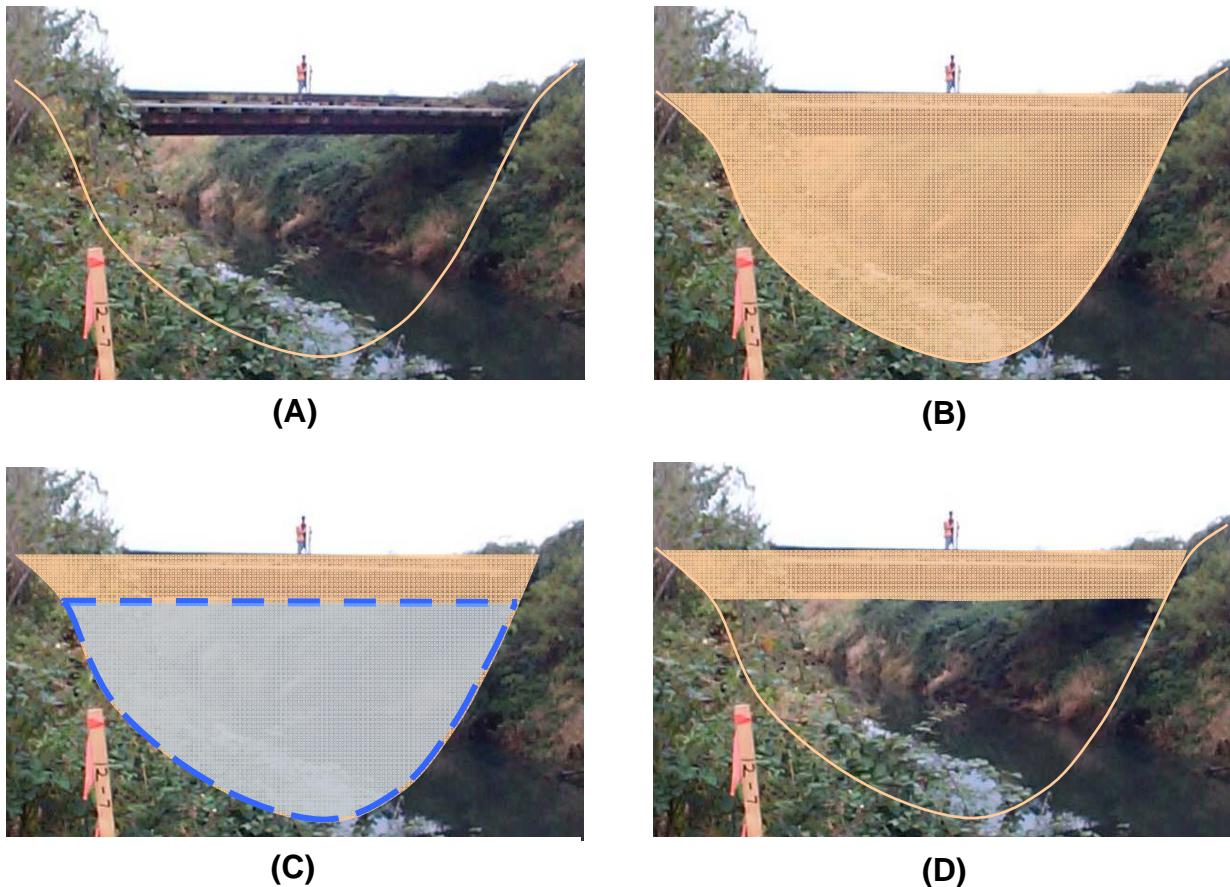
Creating bridges in the hydraulic model: (A) A typical surveyed cross-section at a bridge location, (B) Weir geometry (shown in brown shading) as defined at the cross-section, (C) Irregular culvert shape (shown in blue shading and dashed line) as defined at the cross-section, (D) Resulting weir/culvert combination representing the bridge opening.
